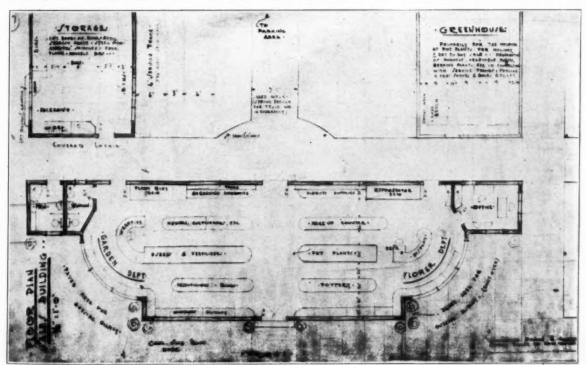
Here is the counter arrangement of the interesting modern sales building from the plan of R. J. Imlay, Zanesville, O. Note the paved areas for outside displays, covered by the building overhang.
